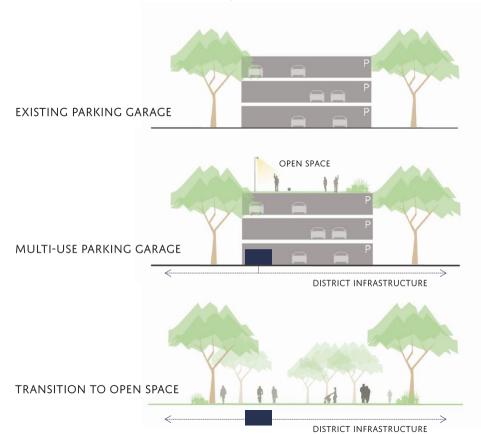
The transition of existing, Council owned, off-street parking to multi-use, transitional and adaptable space.
